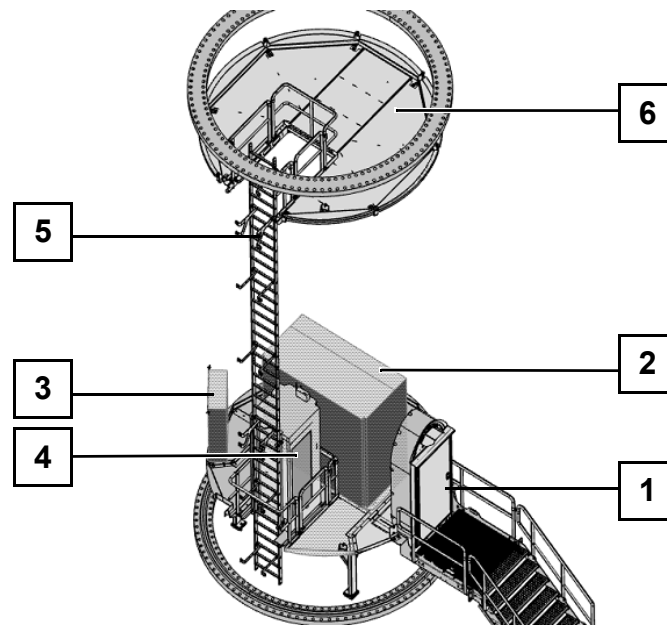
Overview of the bottom section in a tubular steel tower, tower plates not shown
